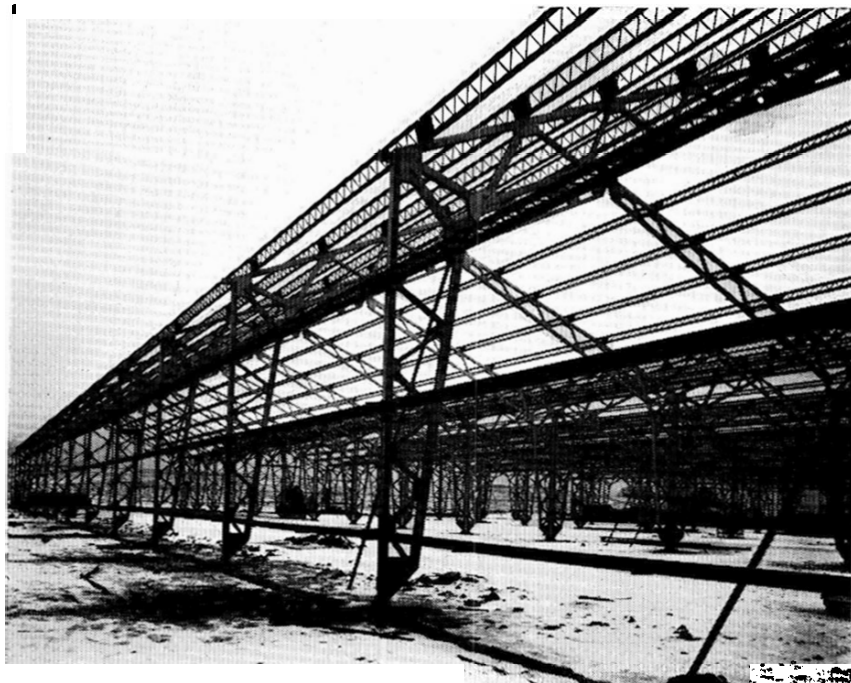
LARGE PREFABRICATED WAREHOUSE CONSISTING ENTIRELY OF COLD-FORMED SECTIONS
